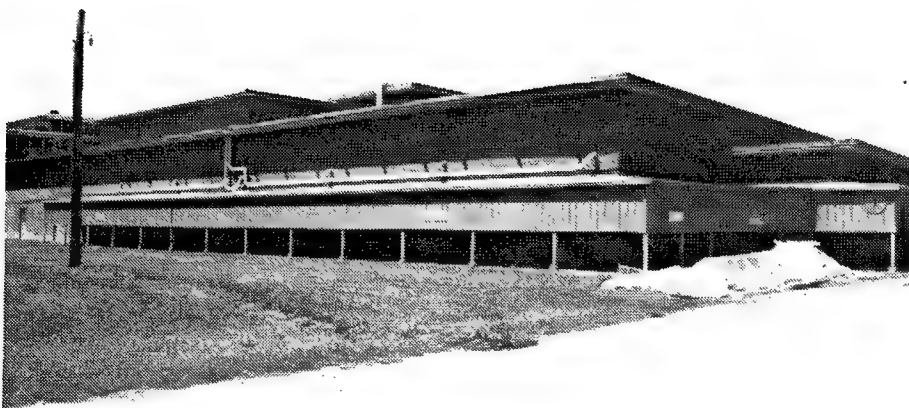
Building 2: 7.62 mm Ammunition Manufacturing Facility, Explosive Wing No. 4.
